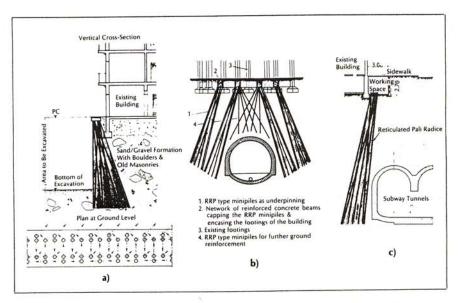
Applications of reticulated micropiles used as in situ reinforcement a) for cut and cover excavation, and b) around bored tunnels. (After Lizzi, 1982)
